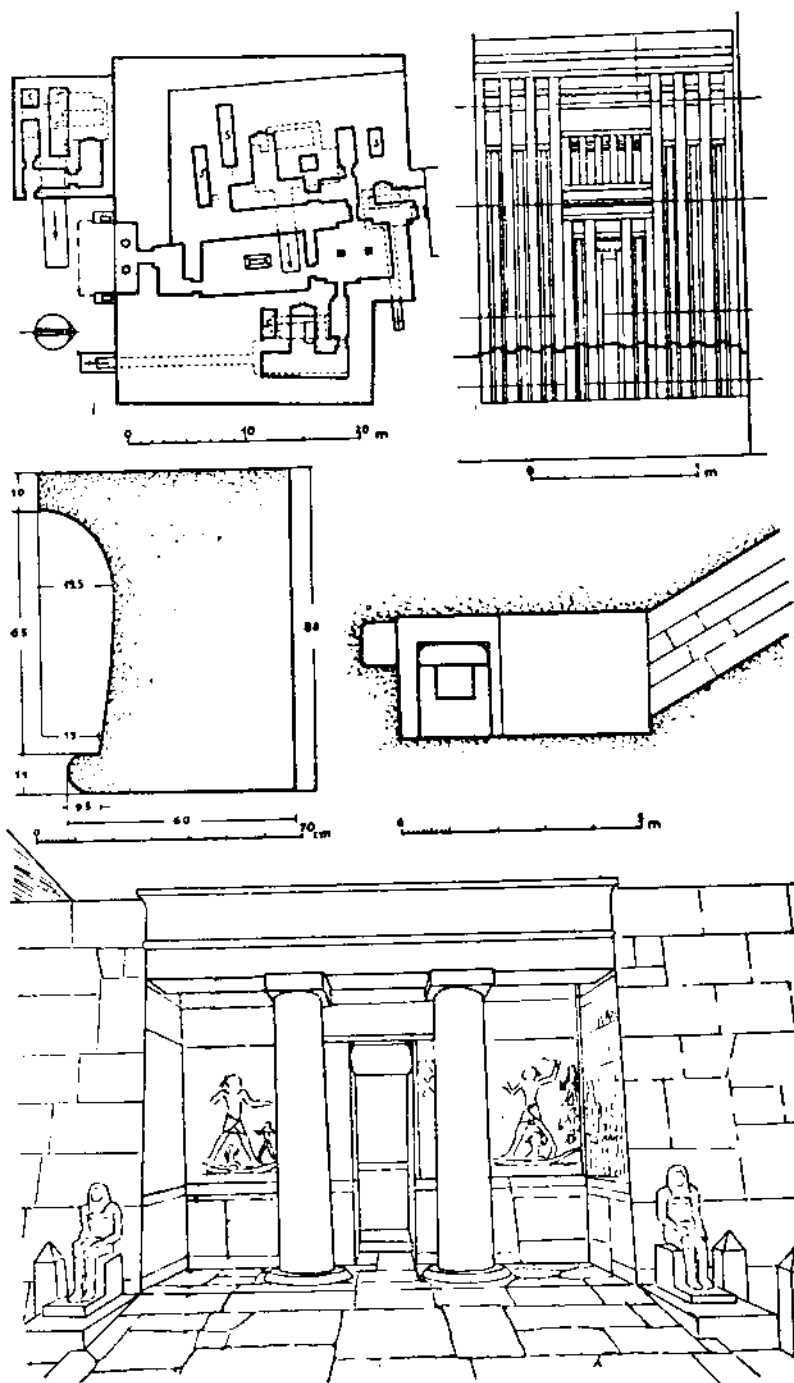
Plan of the superstructure and front elevation of the mastaba of Seshemnefer (Giza, VIth dynasty). section of the burial-chamber. detailed elevation of a palace-façade stela and section of cornice.
